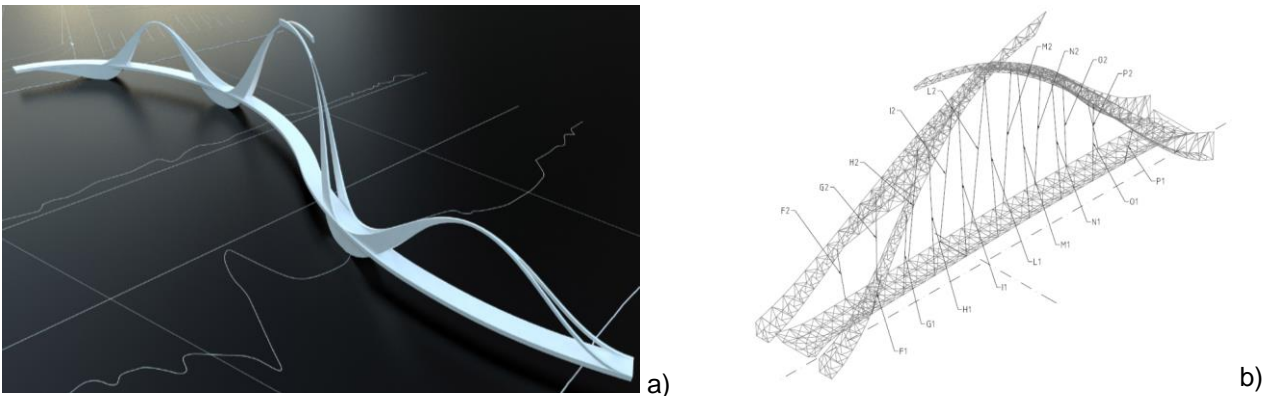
a) Architectonic proposal for the bridge, b) Wireframe of the structural geometry in reticular space frame
